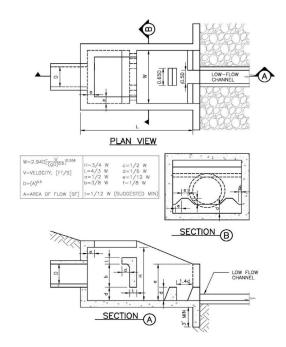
UDFCD modified USBR type VI impacts stilling basin (general design dimensions)
